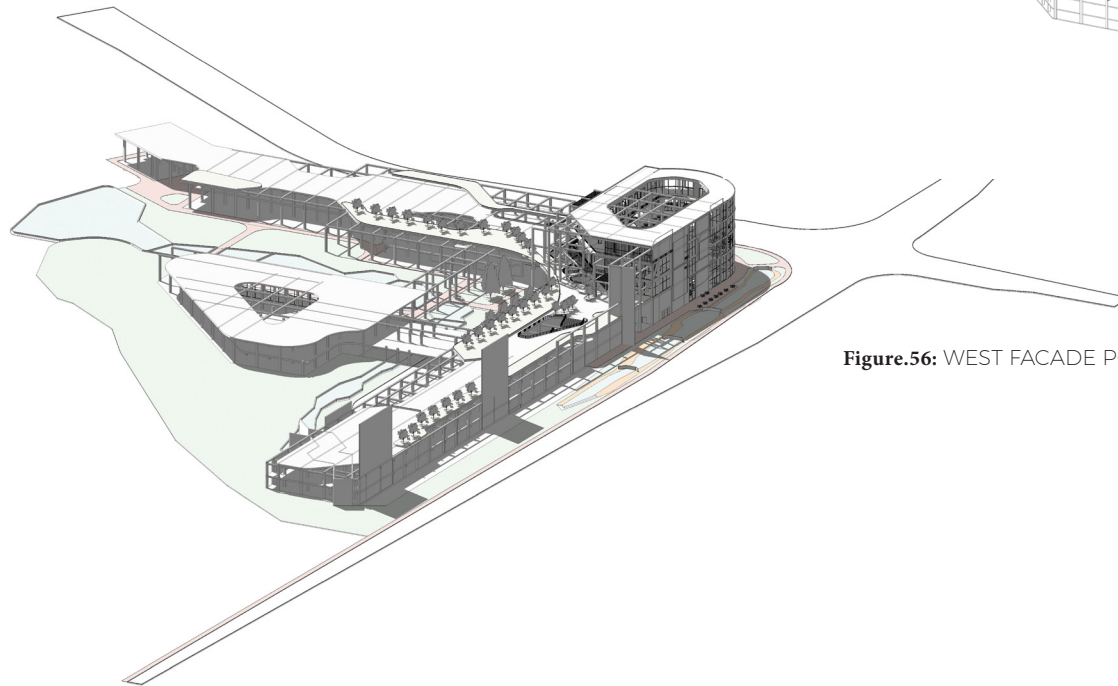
WEST FACADE POST DECONSTRUCTION (AUTHOR 2021)
